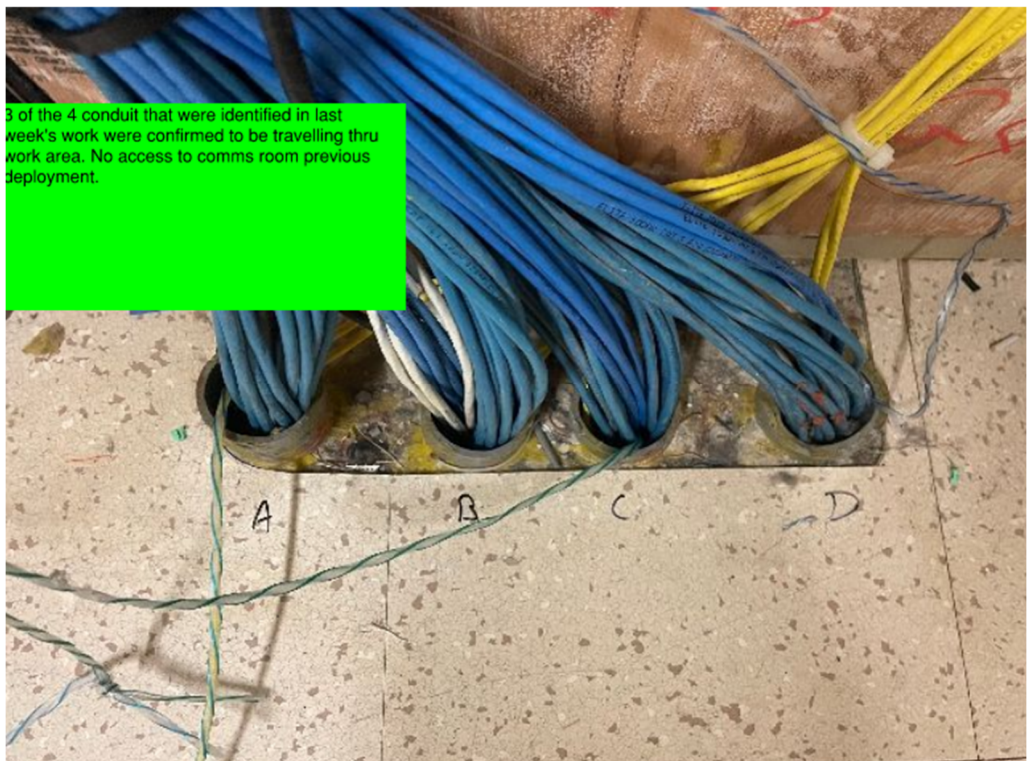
Underground conduits A, B, C and D inside Communication Room #16 1F196
